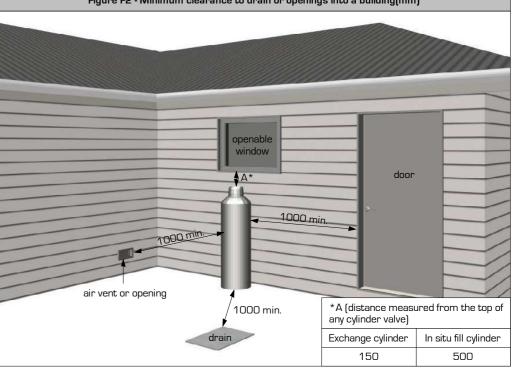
Minimum clearance to drain or openings into a building(mm)
